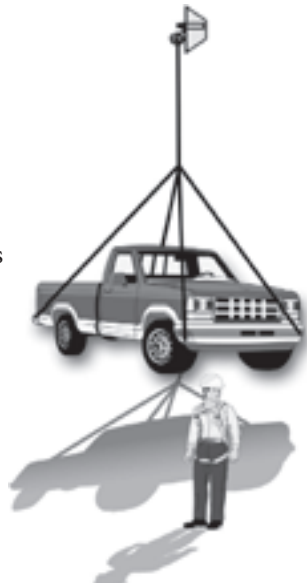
Anchorages should be strong enough to support the weight of a pickup truck. Would you be willing to hang your truck from an anchor and stand below it? If not, pick a new anchor.
